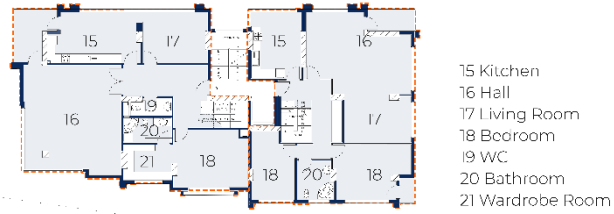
Nursel Kaymakçı Apartment First and Second Floor Plan.
